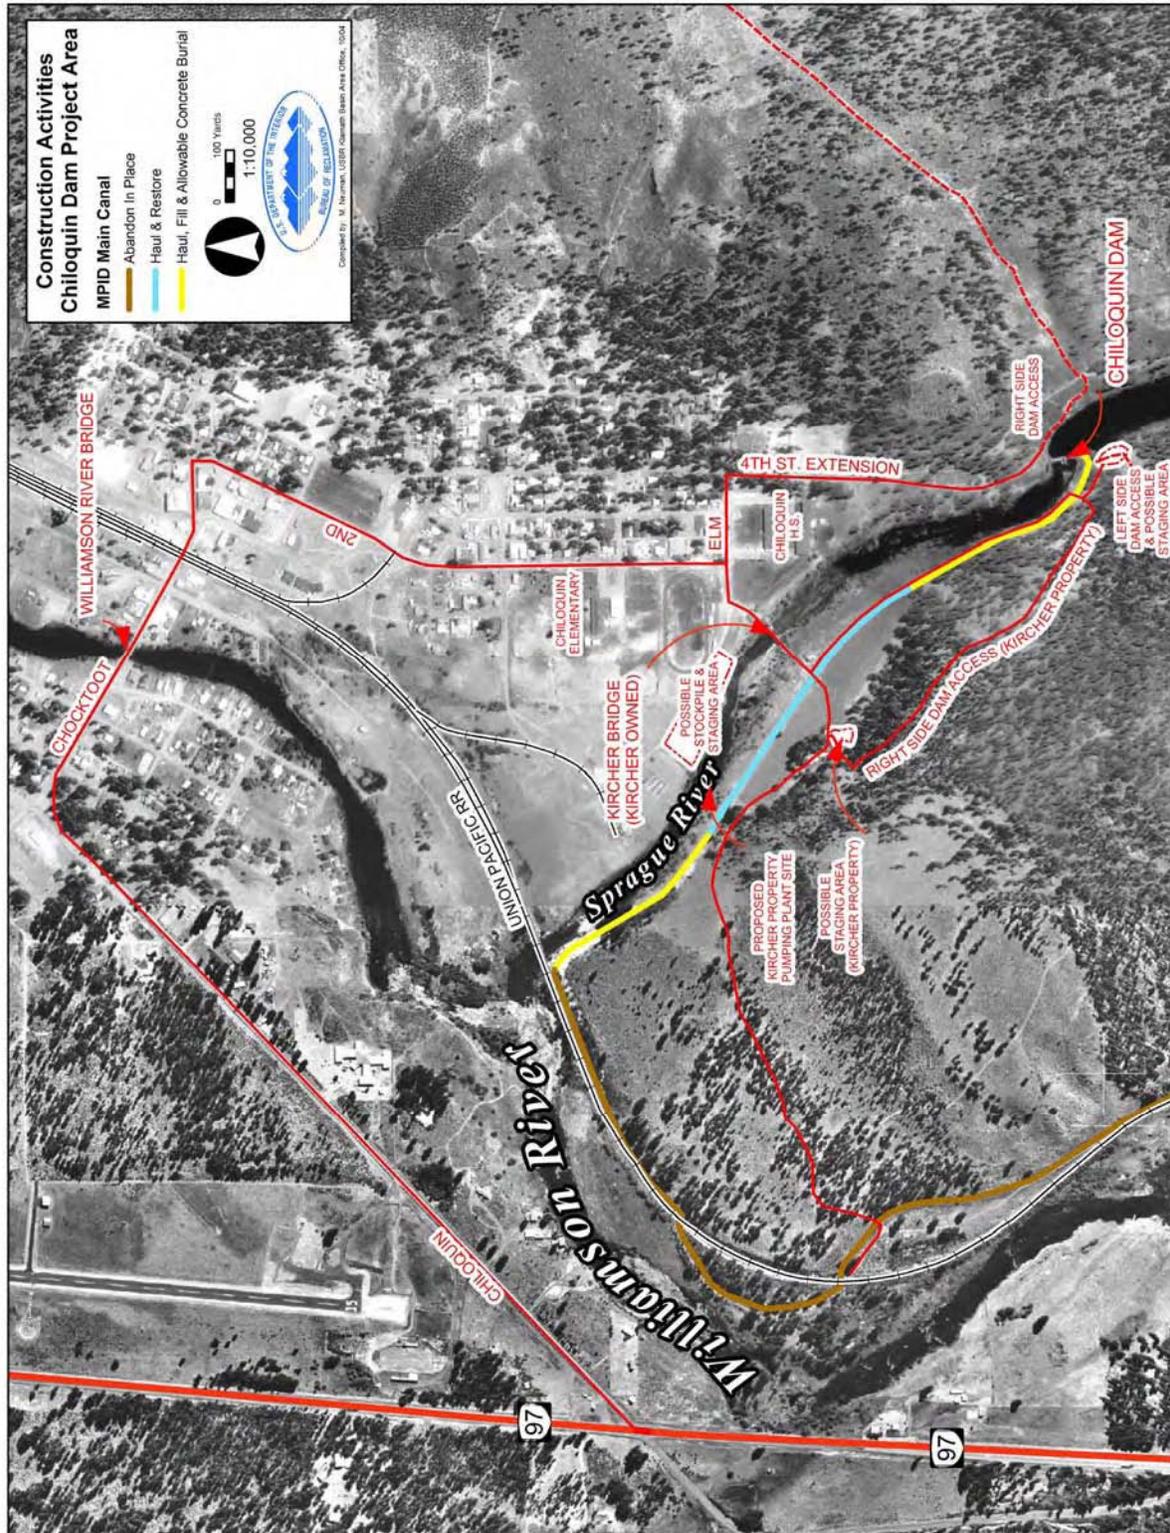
Construction Activities, Chiloquin Dam Project Area
